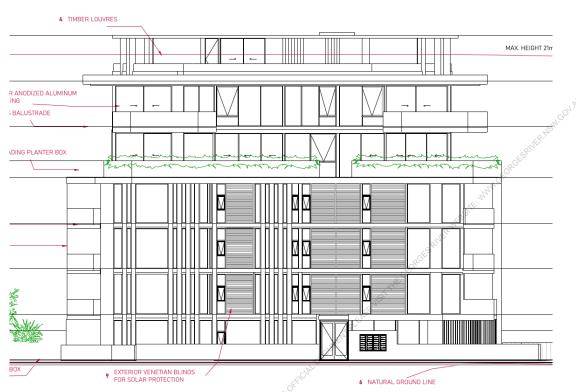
Elevation plan (Park Road (southwest) elevation)
